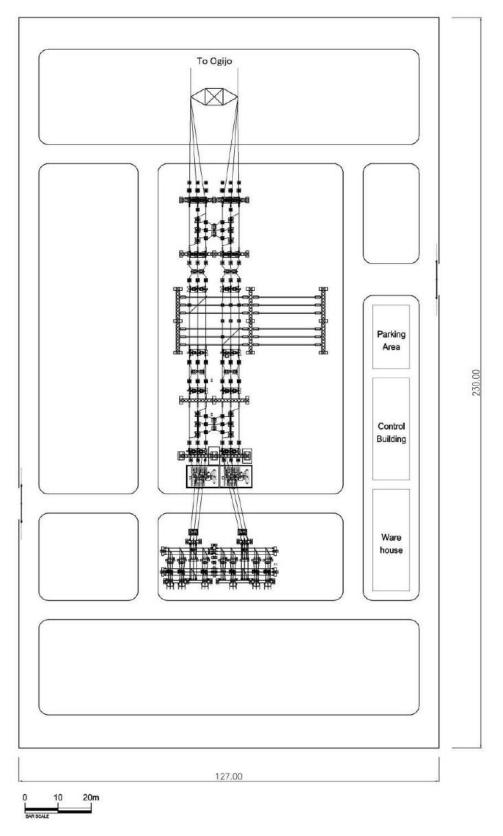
Draft Layout plan of 132/33 kV Redeem Substation
